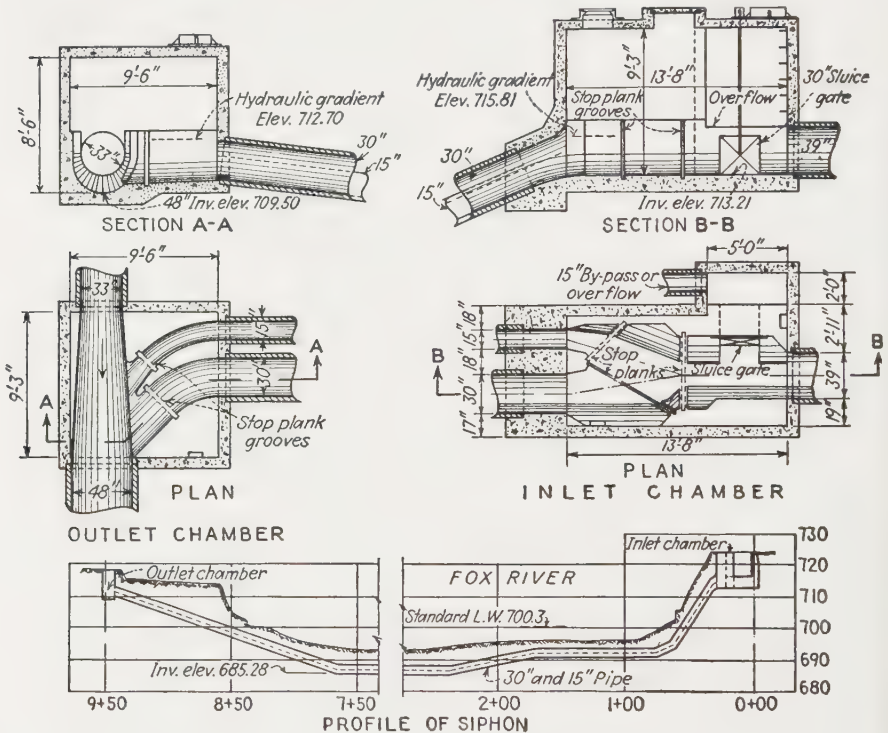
Profile of crossing, plan of inlet chamber, and plan of outlet chamber.
